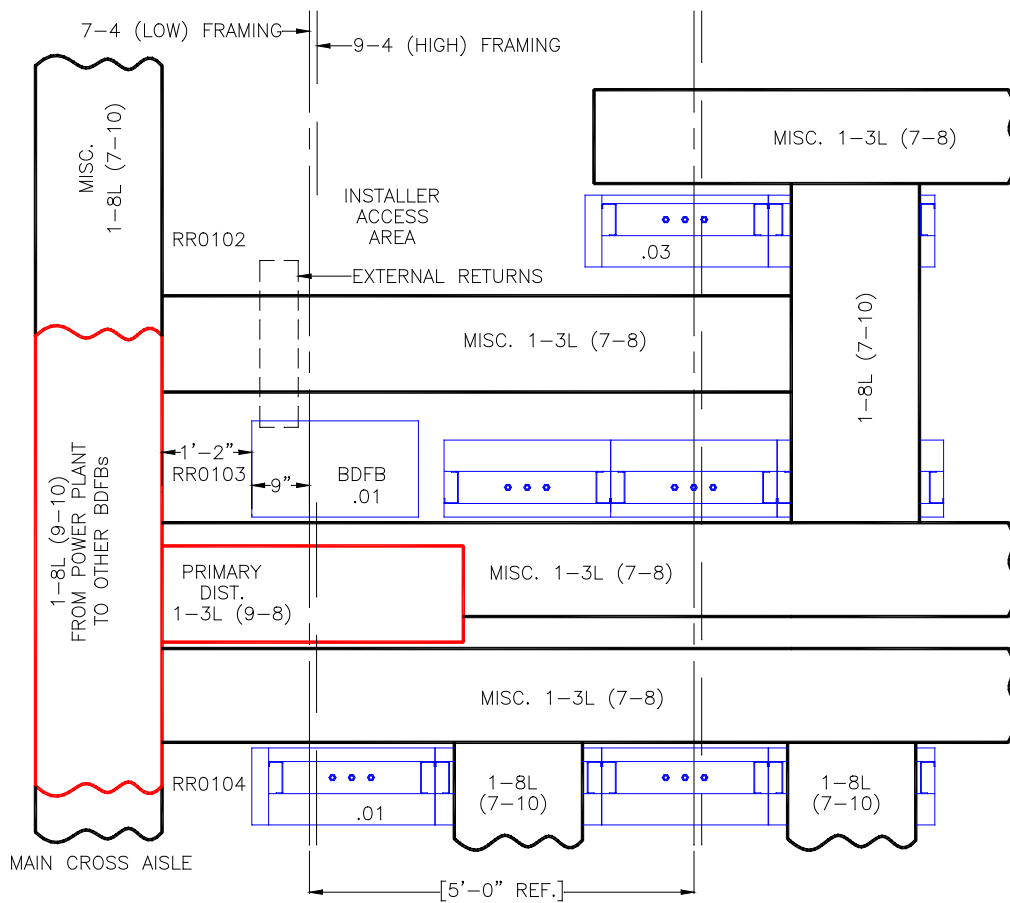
DOWNSPOUT DROP OPTIONS
